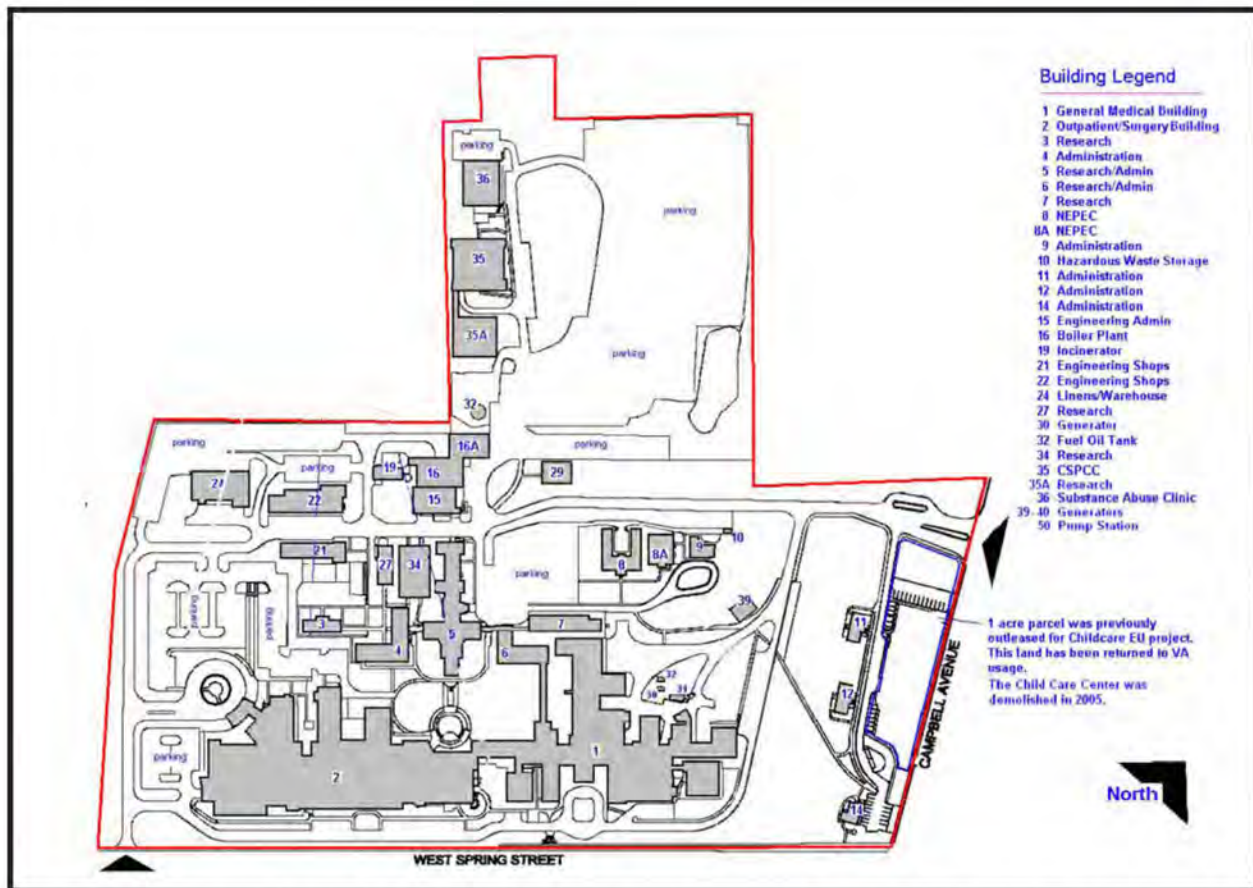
Plan of West Haven VAMC showing locations of buildings and infrastructure. (Courtesy West Haven VAMC).
